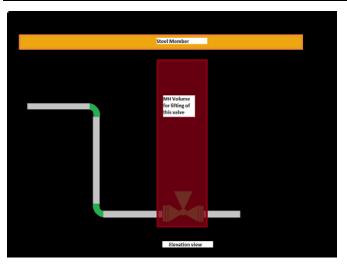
(b). Elevation View of MH head clearance requirement for valve removal
